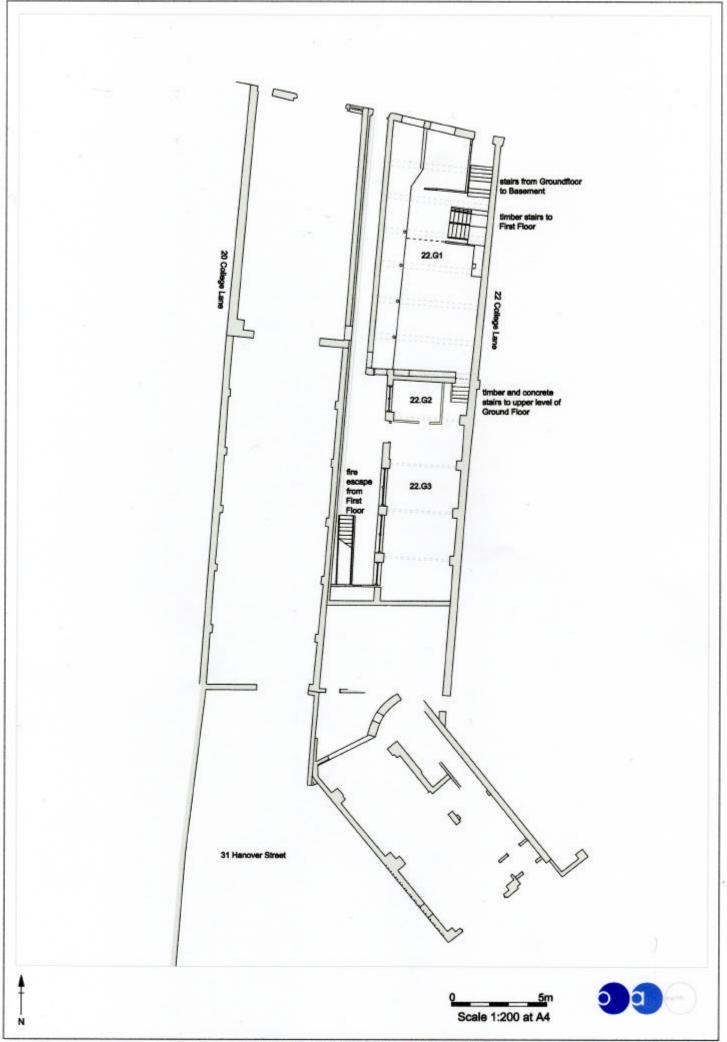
Detailed Plan of 22 College Lane, Ground Floor
